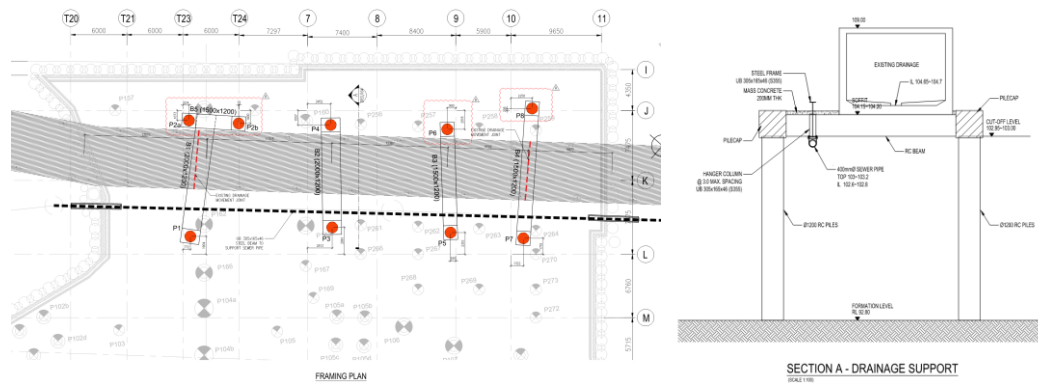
Temporary support layout for 5.5m drain and sewer to facilitate DLN Core 1 Top-Down Construction
